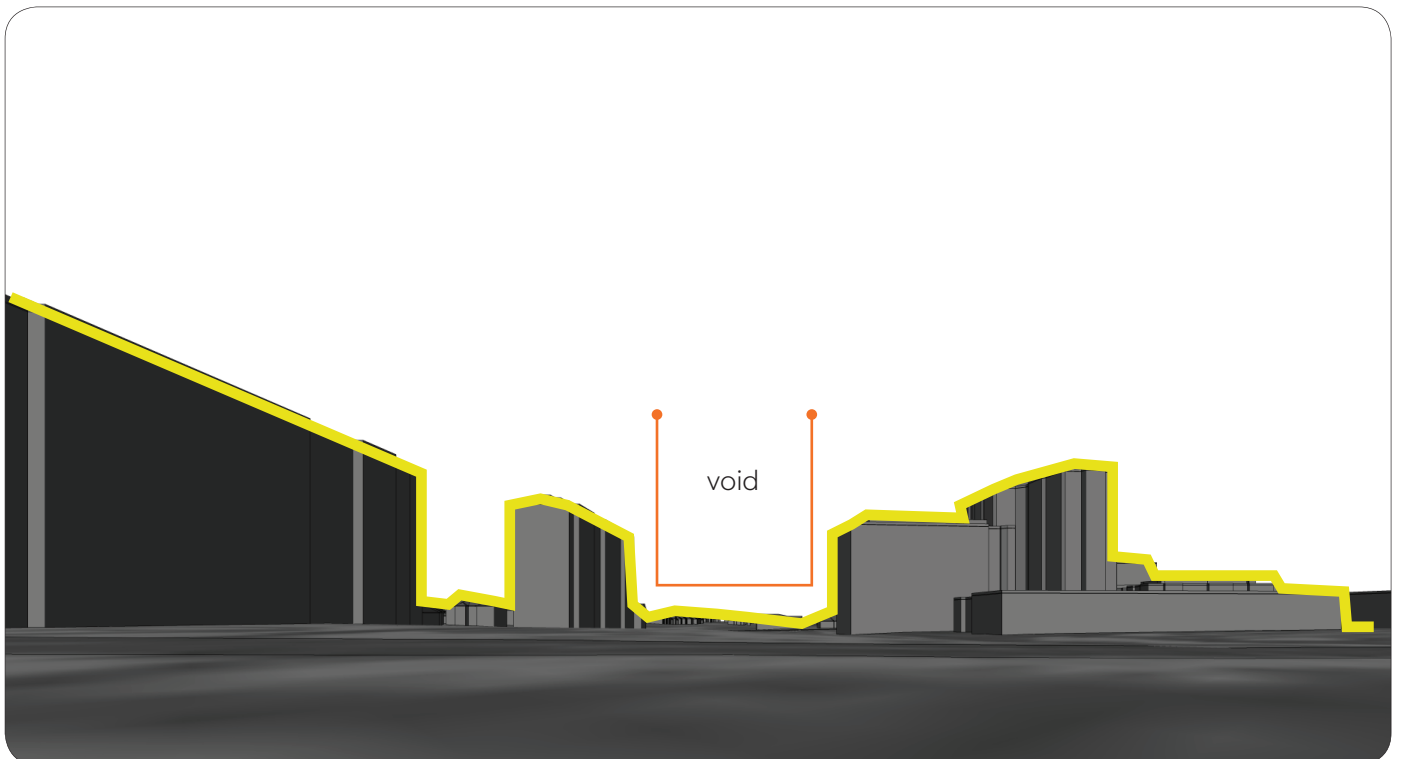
Existing Street Condition looking southeast towards King Street East: Prepared by Studio JCI.
